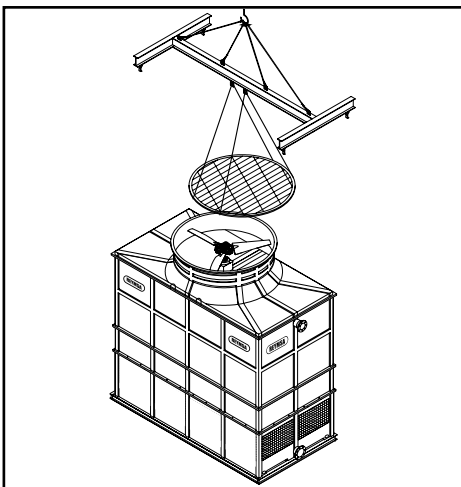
Fan guard installation of the fan deck in an RTGM and RTGMTC Tower model.
